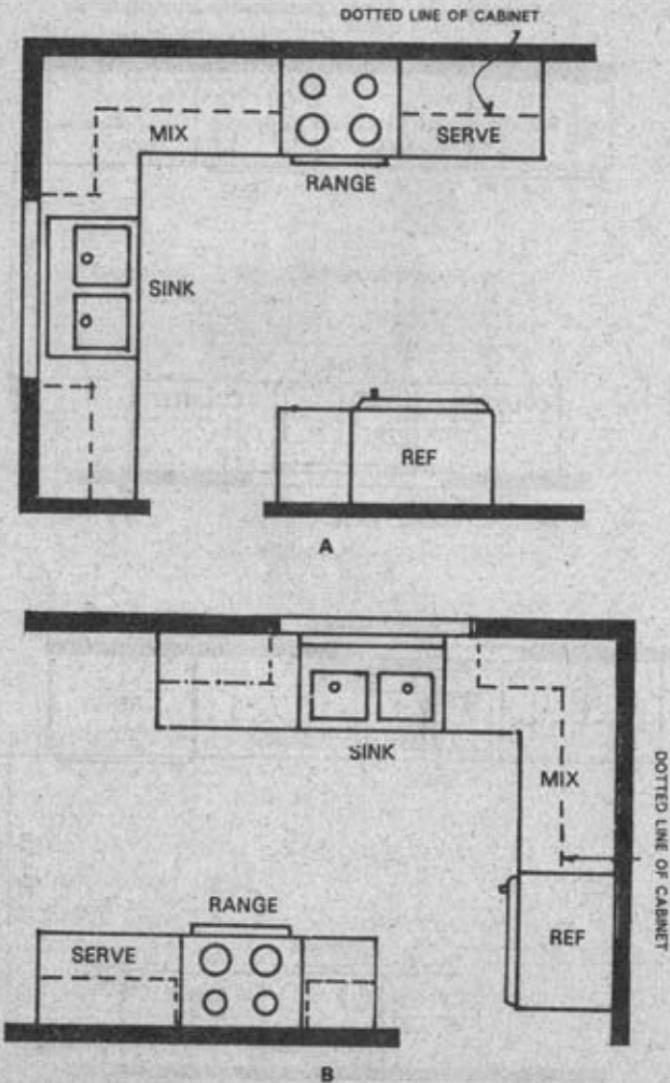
PLAN OF BROKEN U-SHAPED KITCHEN
